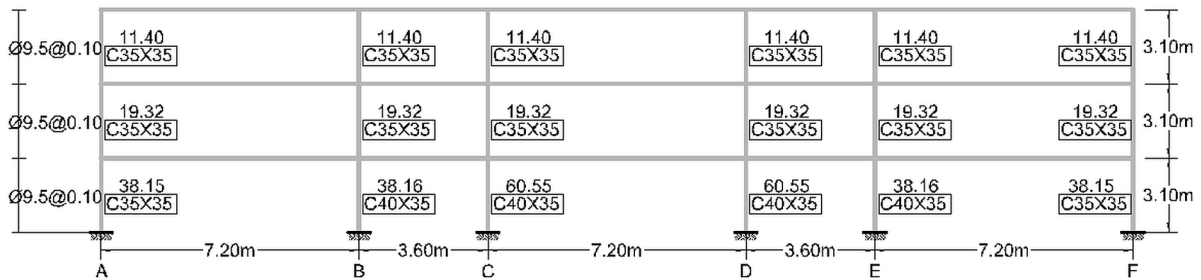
Educational facility, geometry and reinforcement in beams of the Frame 6
